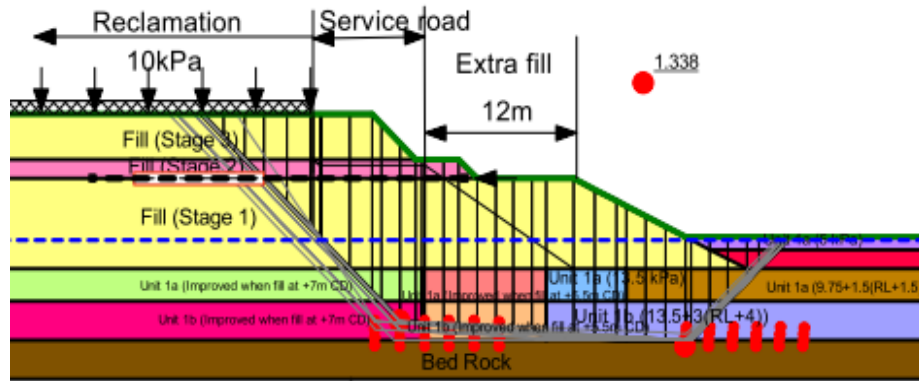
Slope stability model for +10.5 mCD level fill (Sliding failure) – Construction stage
